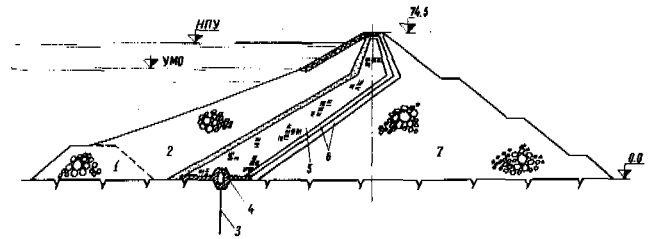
Rockfill dam with suglinok core. 1--rock toe; 2--upstream shell; 3--grout curtain; 4--grouting gallery; 5--core made of suglinok; 6--filters; 7--supporting rockfill prism.
